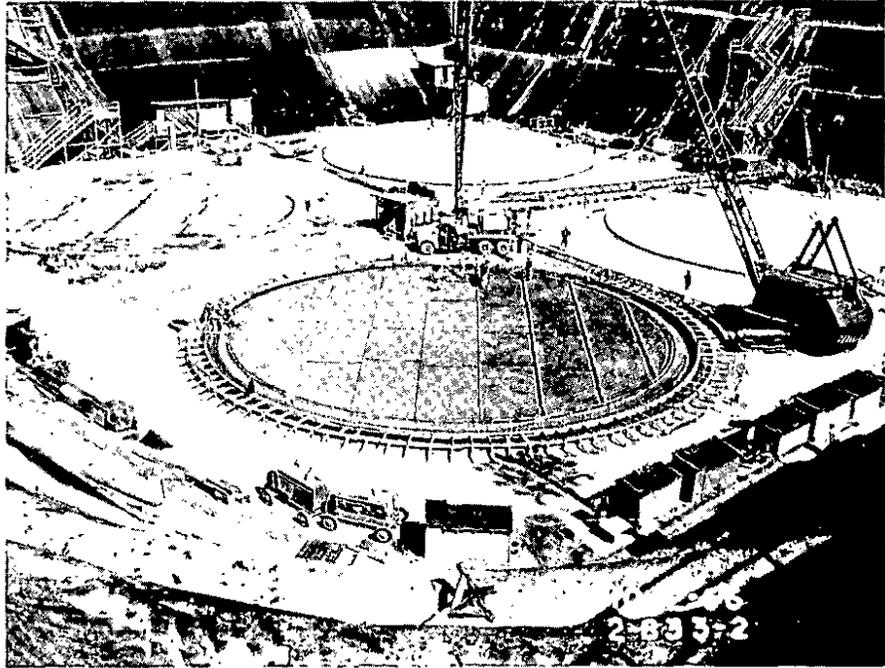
EXHIBIT VI-A FLOOR SLABS AND FOUNDATIONS SHOWING FORMWORK FOR DRAINAGE CHANNELS
